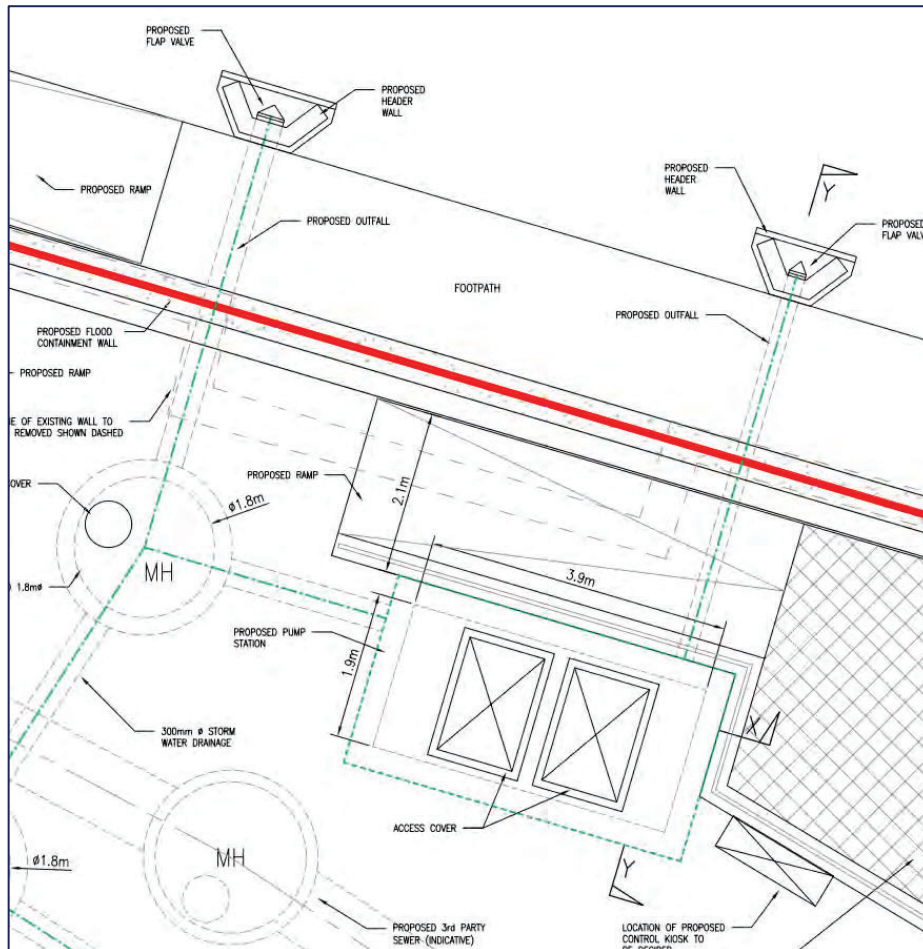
Typical pump station layout plan along River Walk. Not to scale.
